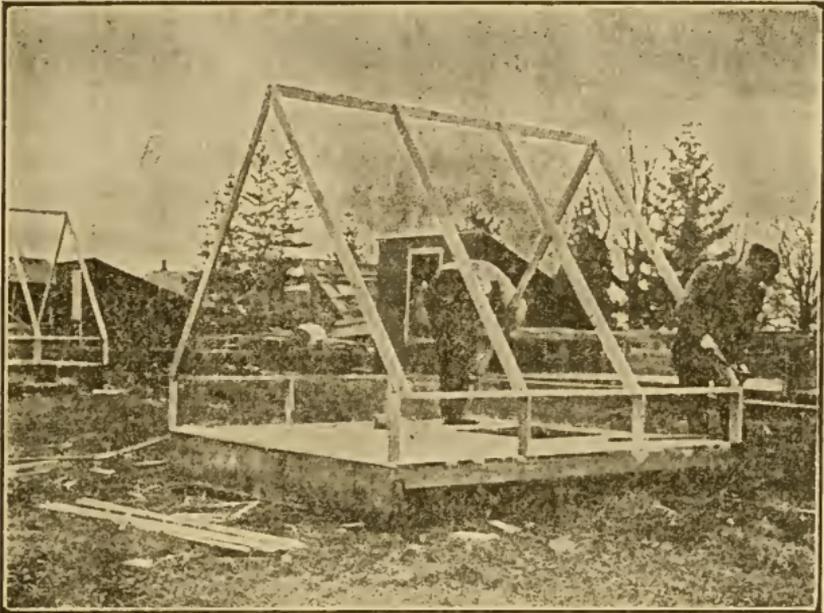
FRAME OF CORNELL COLONY-BROODER HOUSE
